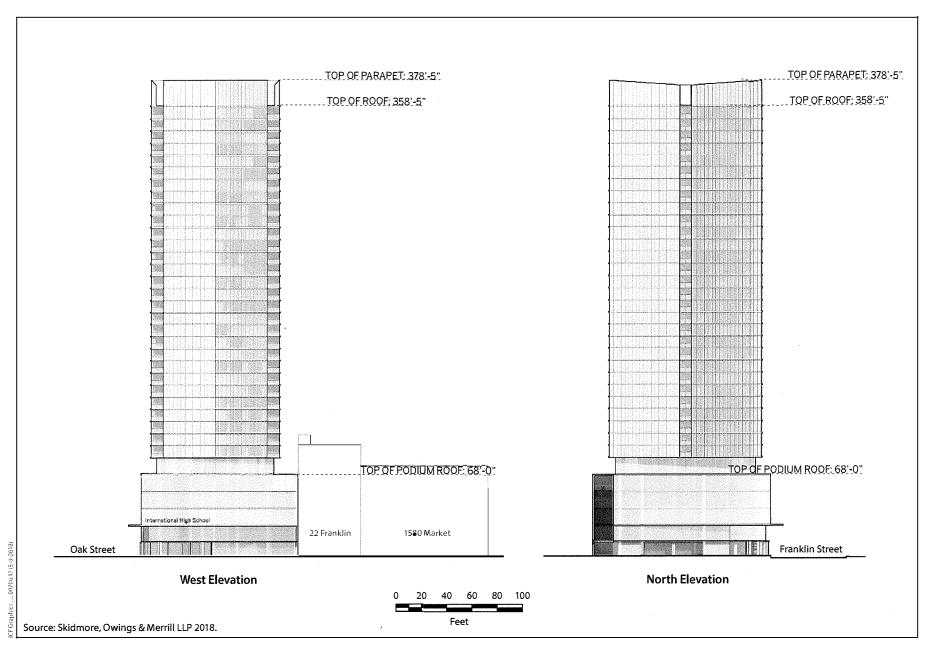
98 Franklin Street Project – Proposed West and North Elevations
